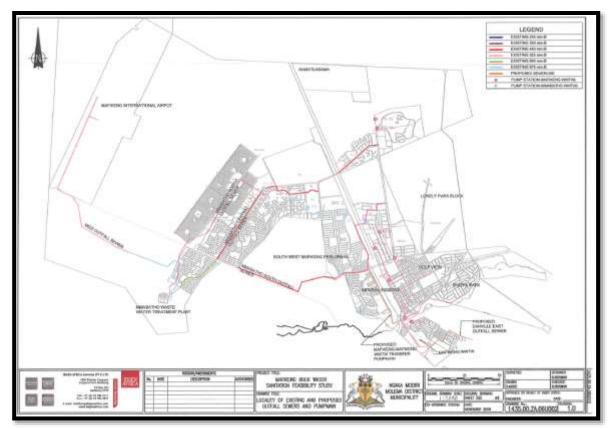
LOCALITY OF EXISTING AND PROPOSED OUTFALL SEWERS AND PUMPMAIN
